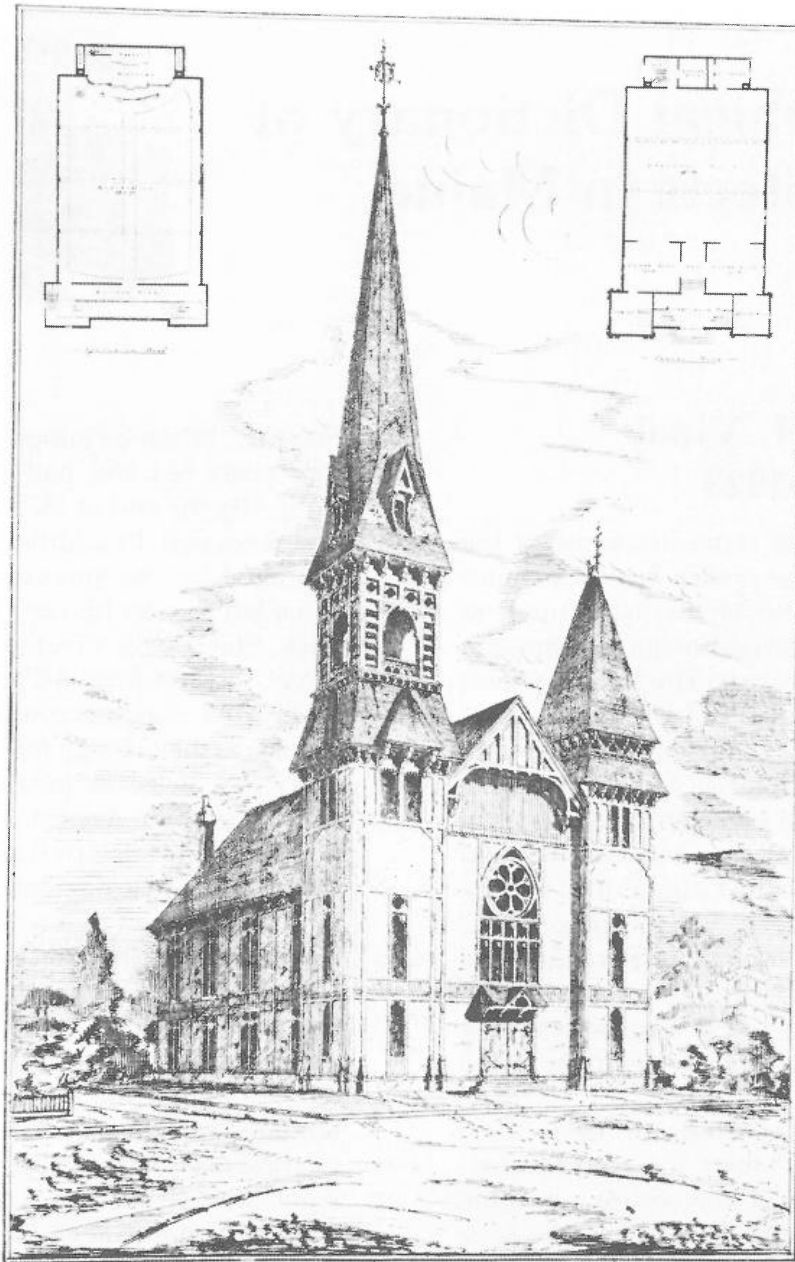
Methodist Church, Farmington, as published in the *American Architect and Building News*, February 17, 1877 (SPNEA, Boston).
